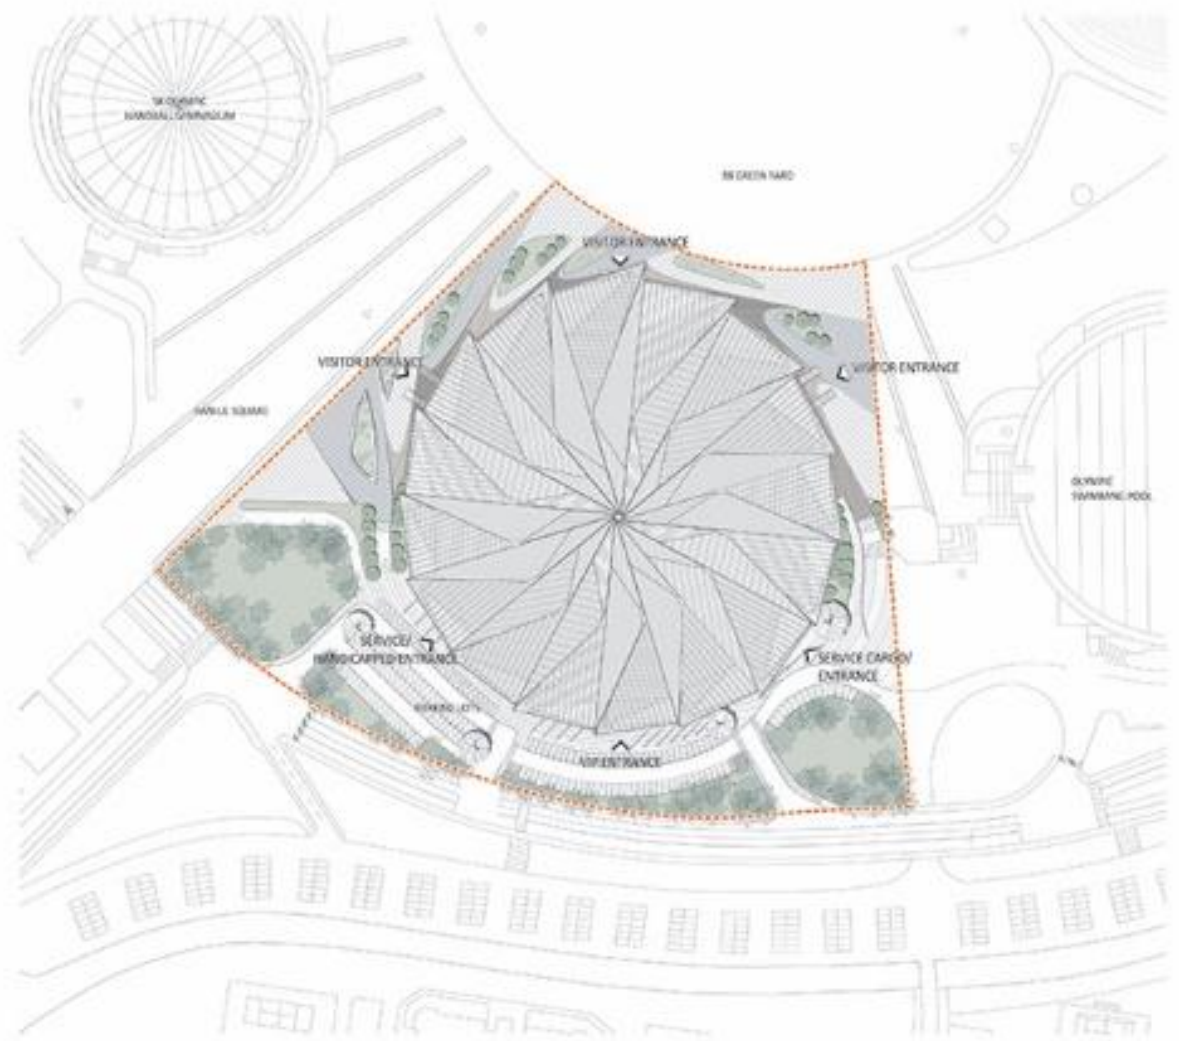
Site Plan of KSPO Dome Arena, South Korea
